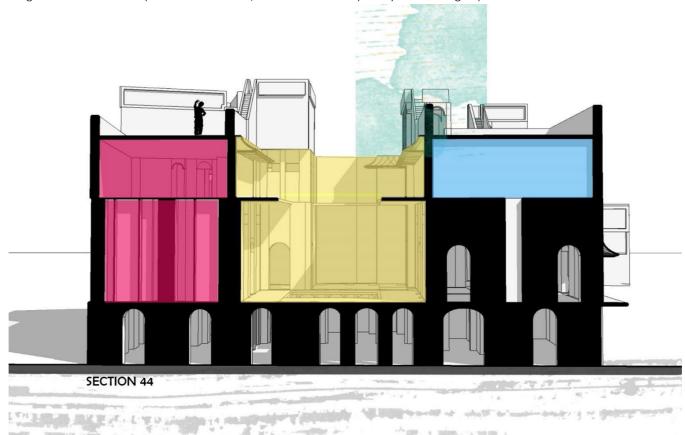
SECTION 4-4 (Authors Illustration, Based on redrawn plan by Pamela Rogers)
